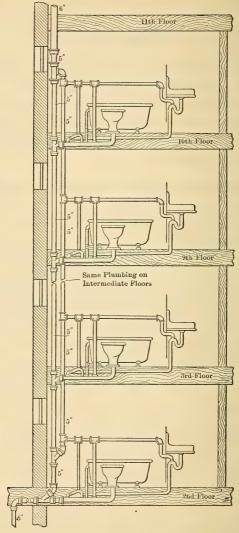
Bath Rooms in the Raleigh Hotel, Washington, D. C.
